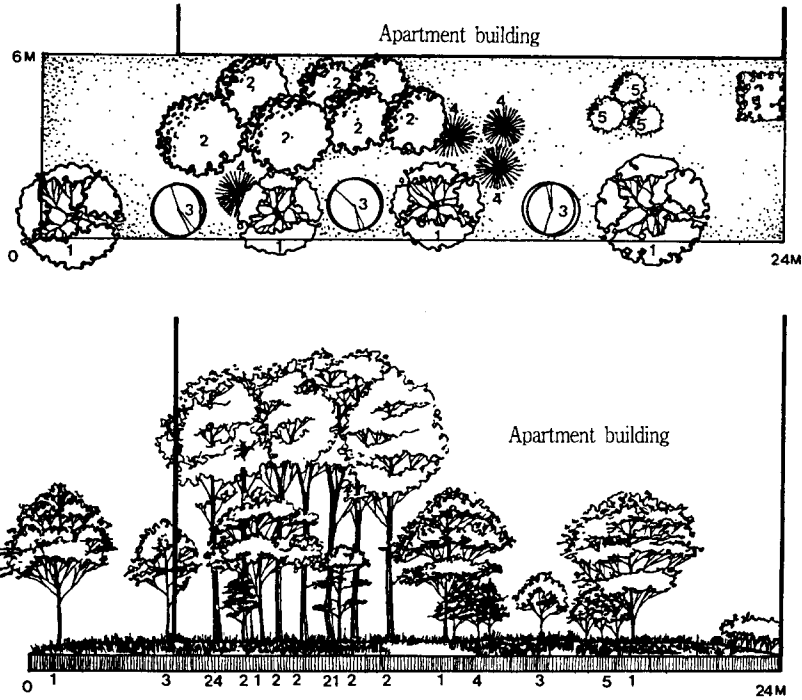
Elevation and plane figure of bad planting area the fourth apartment complex
